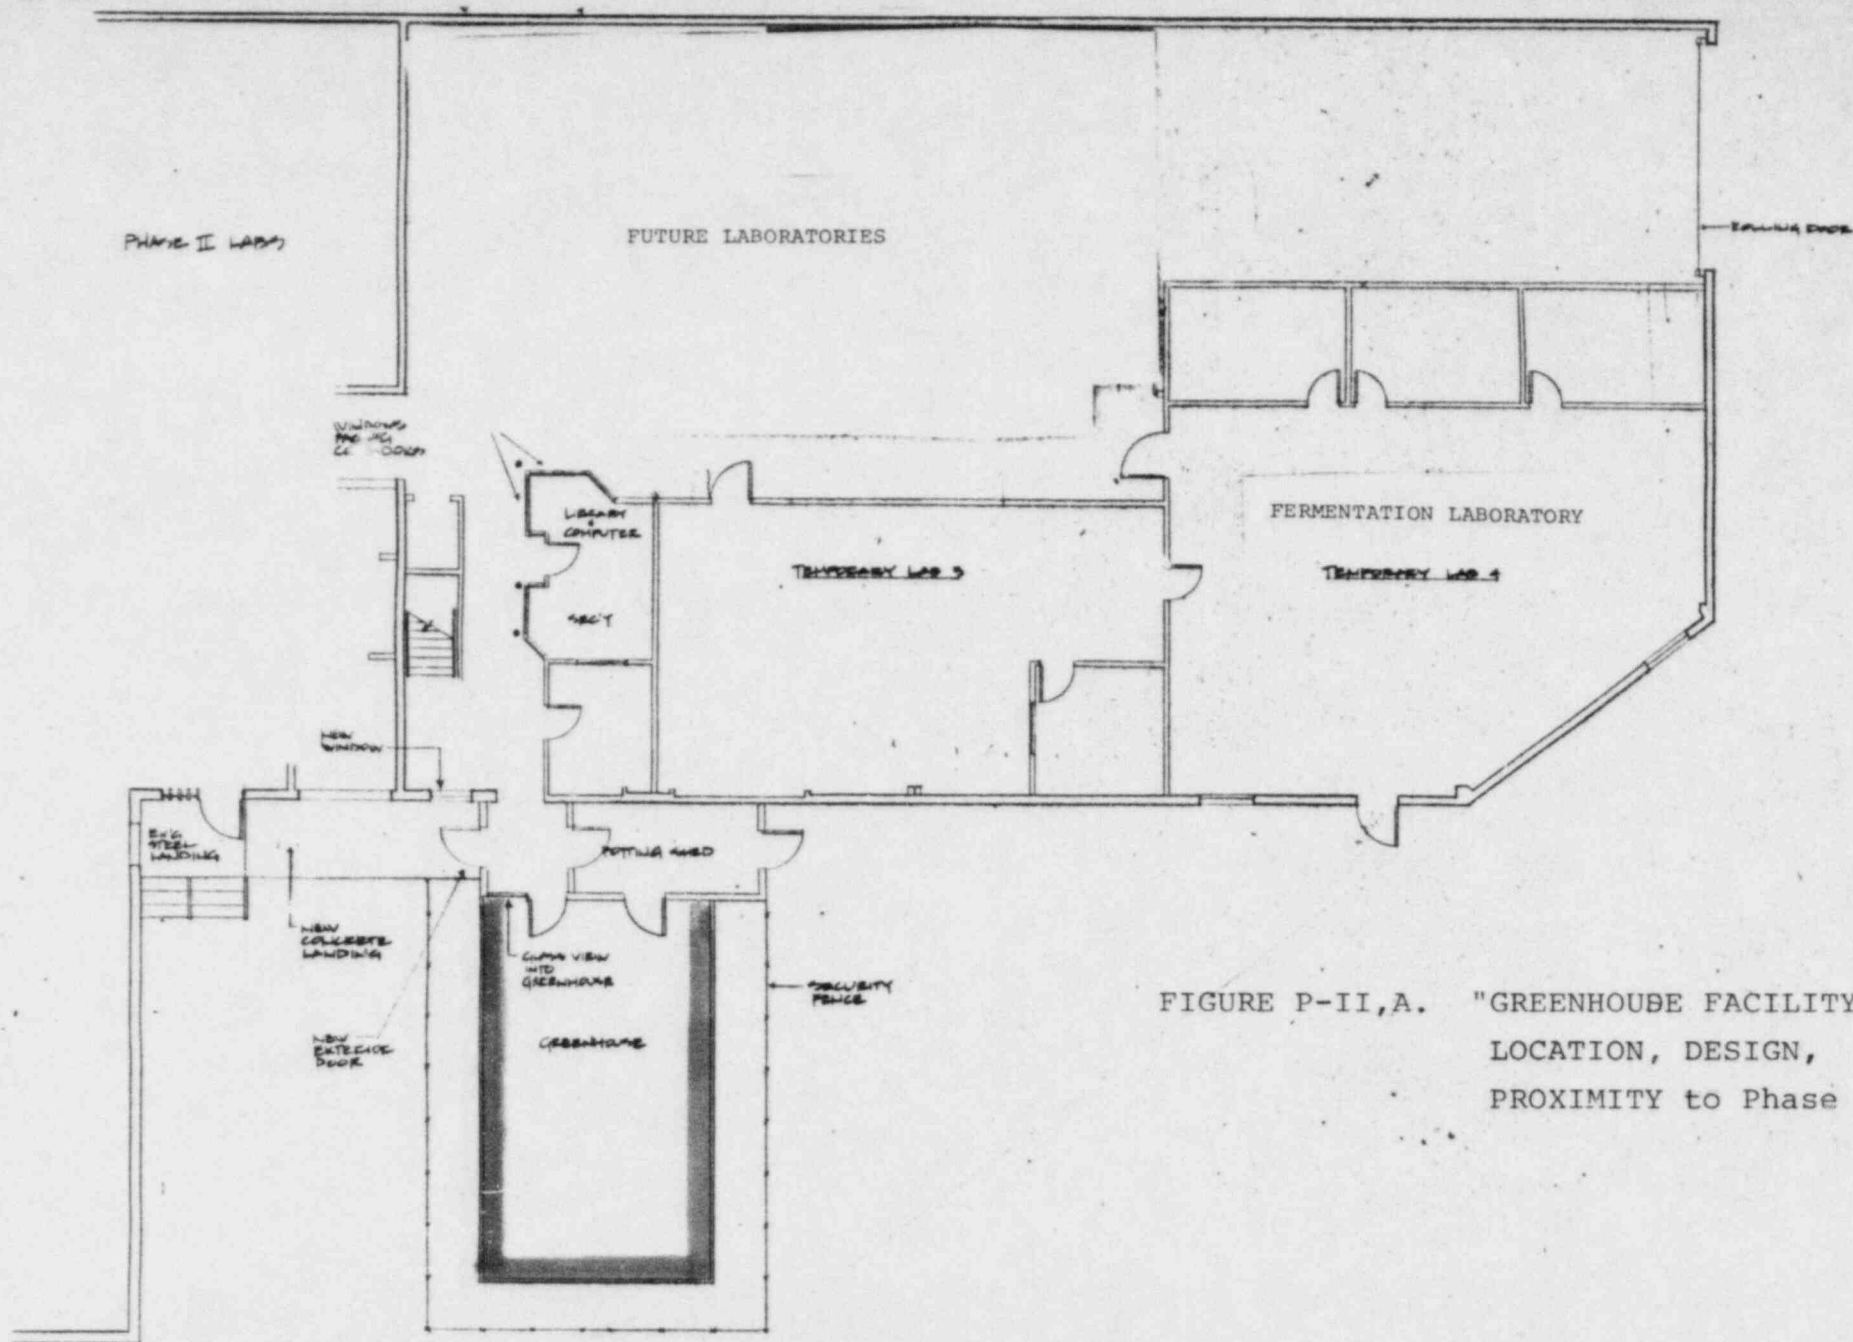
FIGURE P-II,A. "GREENHOUSE FACILITY:
